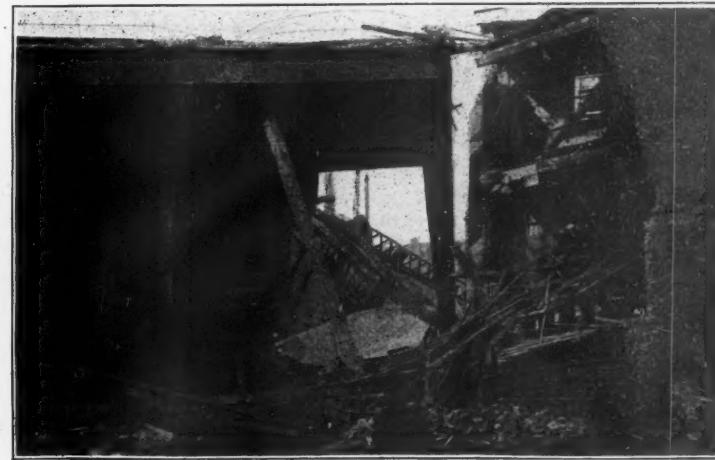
Gas Tank Failure—Looking North from Twentieth Street.
